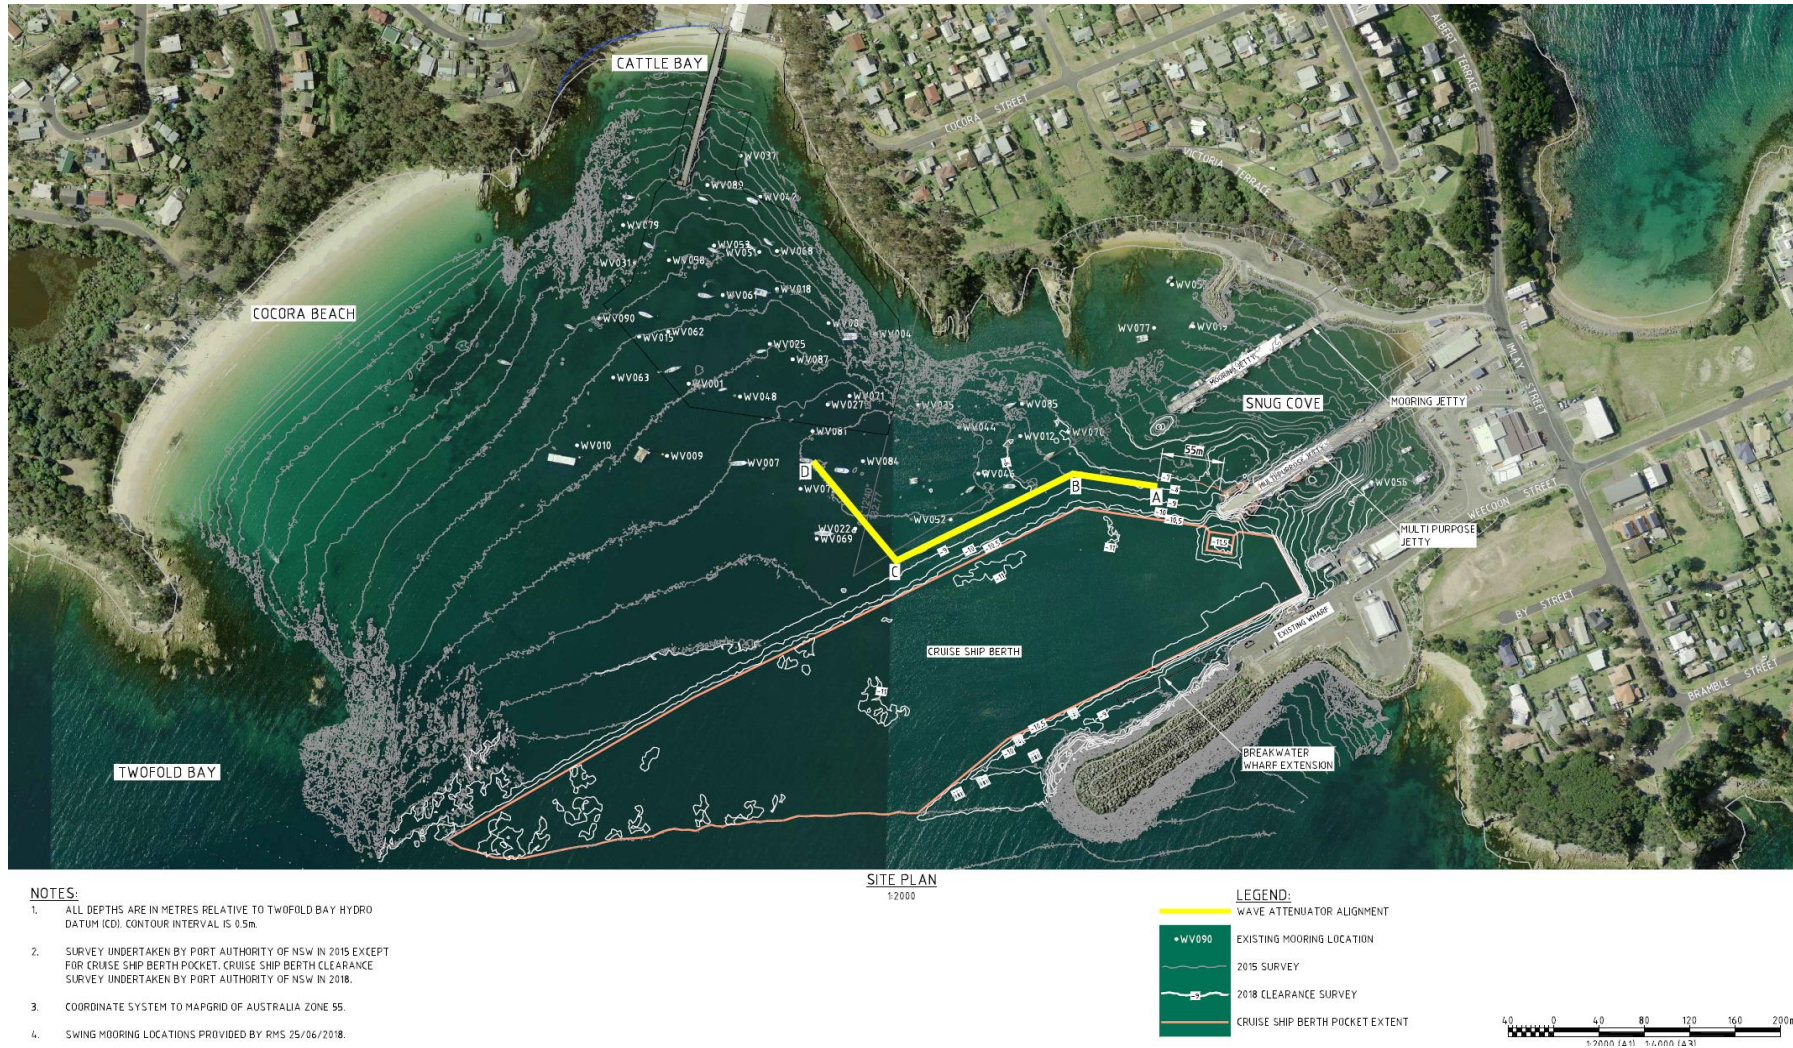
Location and site plan of the proposed modification (Source: WorleyParsons, 2018)
